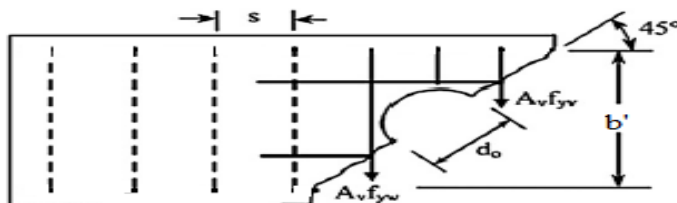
shear resistance V_s provided by shear reinforcement at an opening
